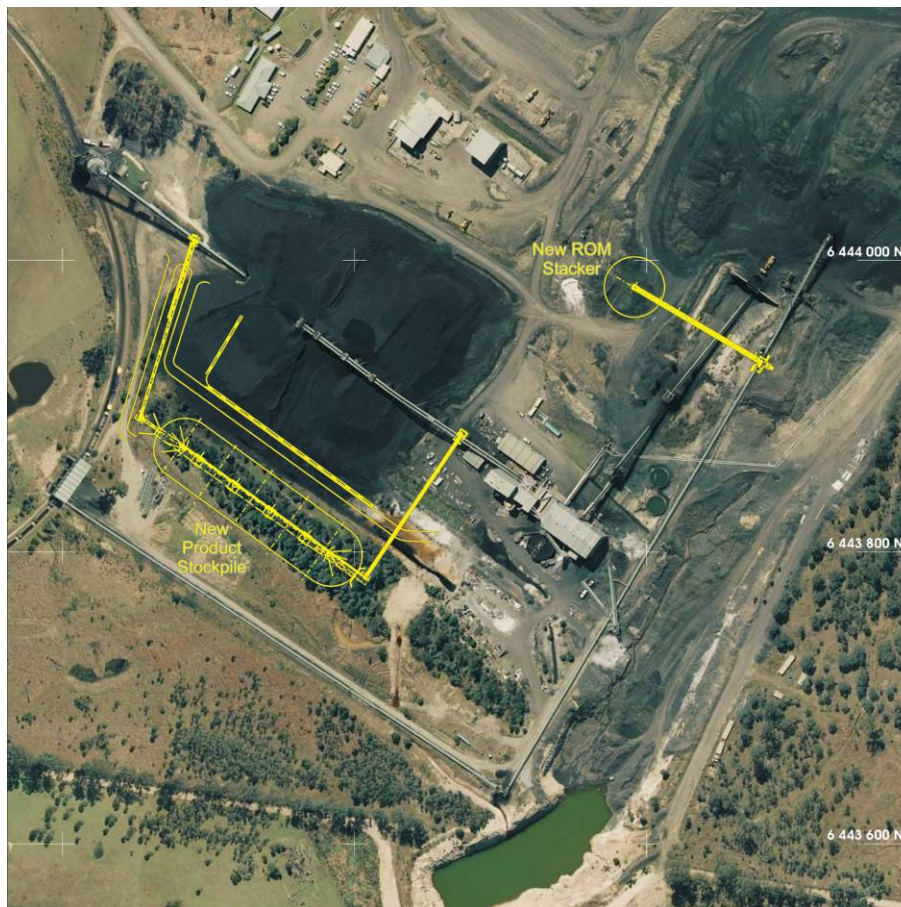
General Arrangement of the Proposed new Product Stockpile and ROM stacker
